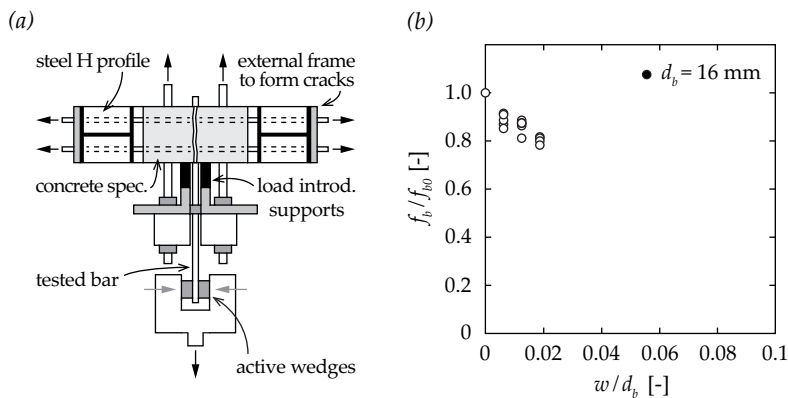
Bond phenomenon in cracked concrete (adapted from [Lin11]): (a) test setup; and (b) test results
